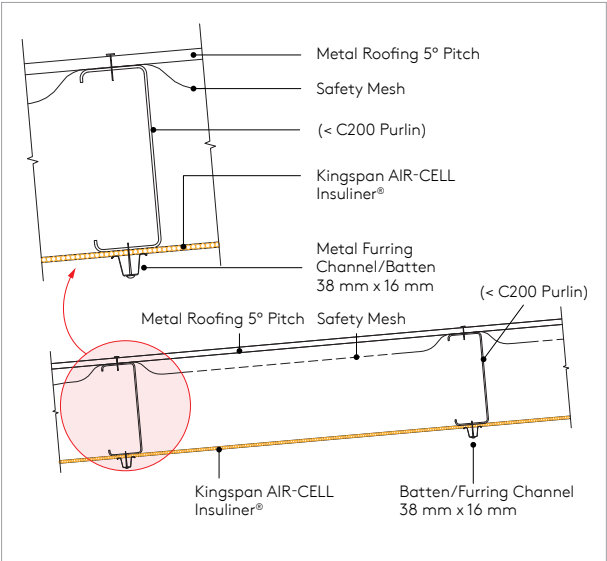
Side elevation of Kingspan AIR-CELL Insuliner® in a warehouse metal deck roof retrofit.
